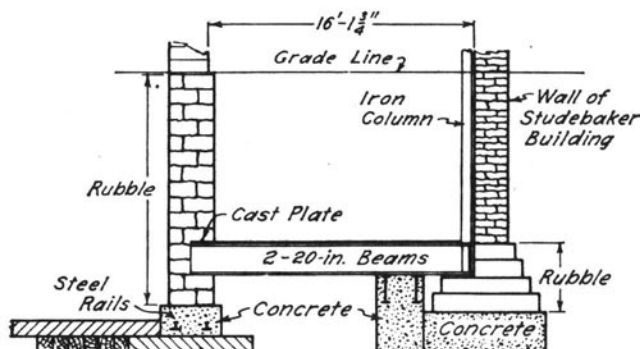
SECTION THROUGH CANTILEVER FOOTING OF AUDITORIUM
